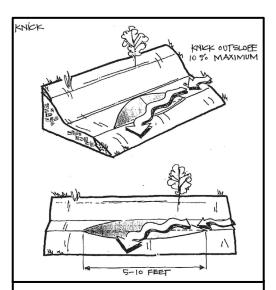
Typical Plan View and Cross Section for Drainage Knick
